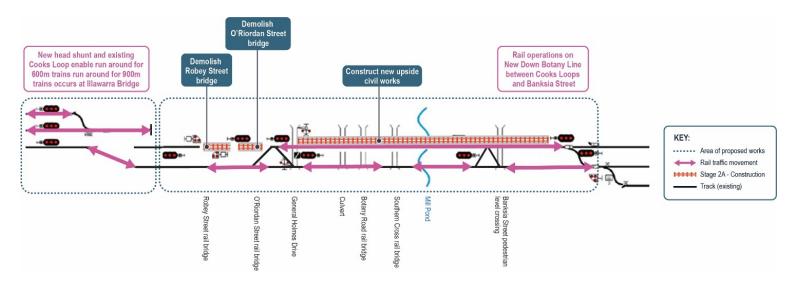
Indicative construction staging – Stage 2A: Demolish existing O'Riordan Street and Robey Street bridges
